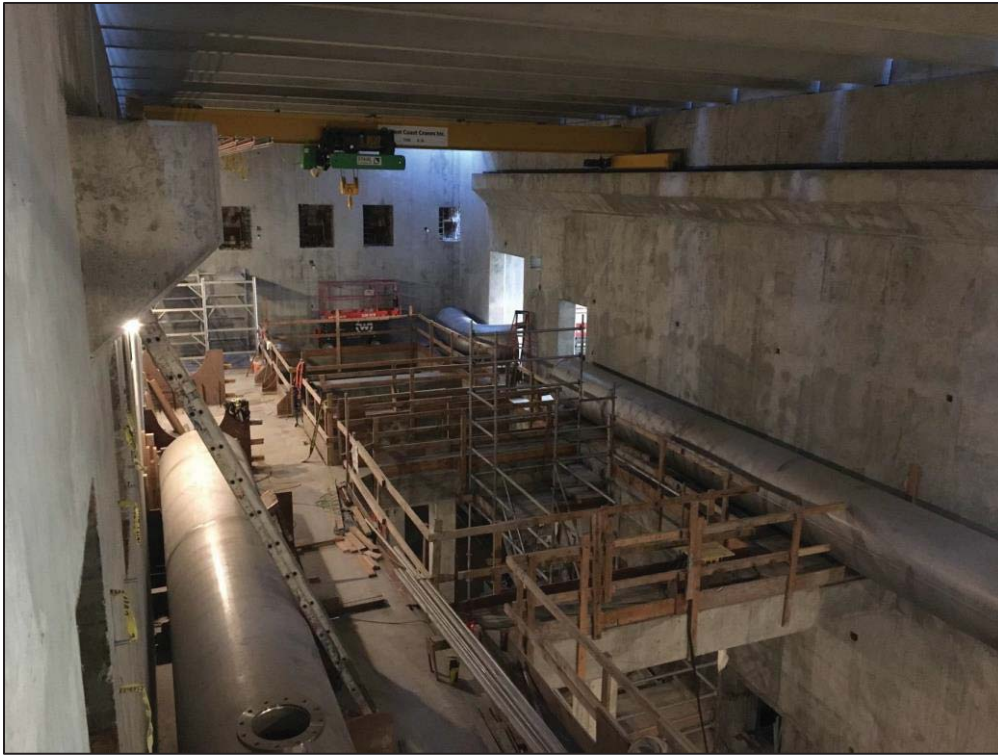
Clover Point Pump Station- Roof slab concrete pour.
